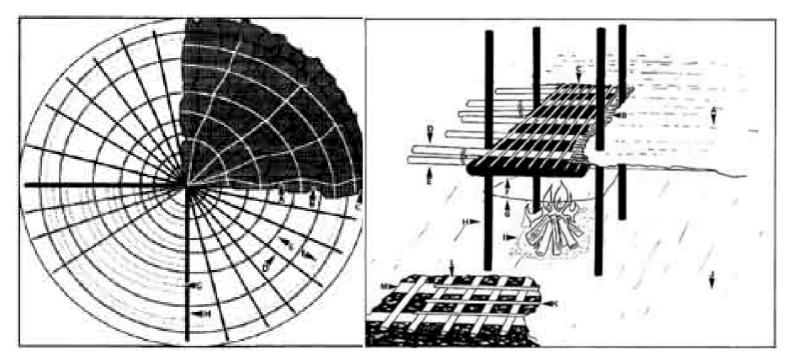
Detail of construction of the men's house at llamik (roof). A) thatch binding (*selebinangge*); B) thatch (*ongga*); C) upper circular purlin (*oholuk*); D) rafter (*fowol*); E) lower circular purlin (*oholuk*); F) line of wall; G) thatch support (*helenghele*); H) main rafter x4 (*salikano*).
